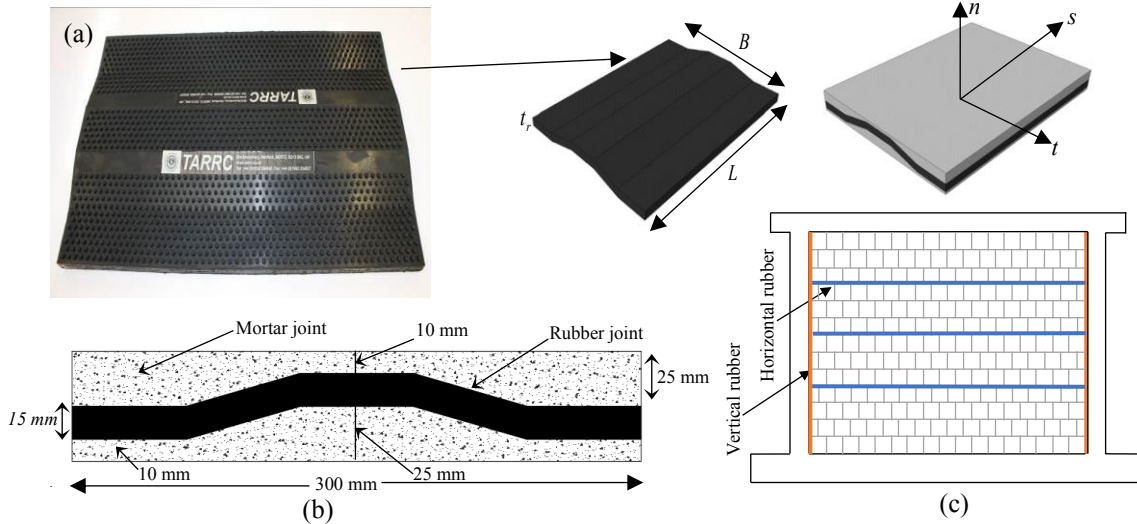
(a) Horizontal rubber joints developed by TARRC [10] (b) cross section of mortar-rubber-mortar joint (c) schematic diagram of modified infill with rubber joints.
